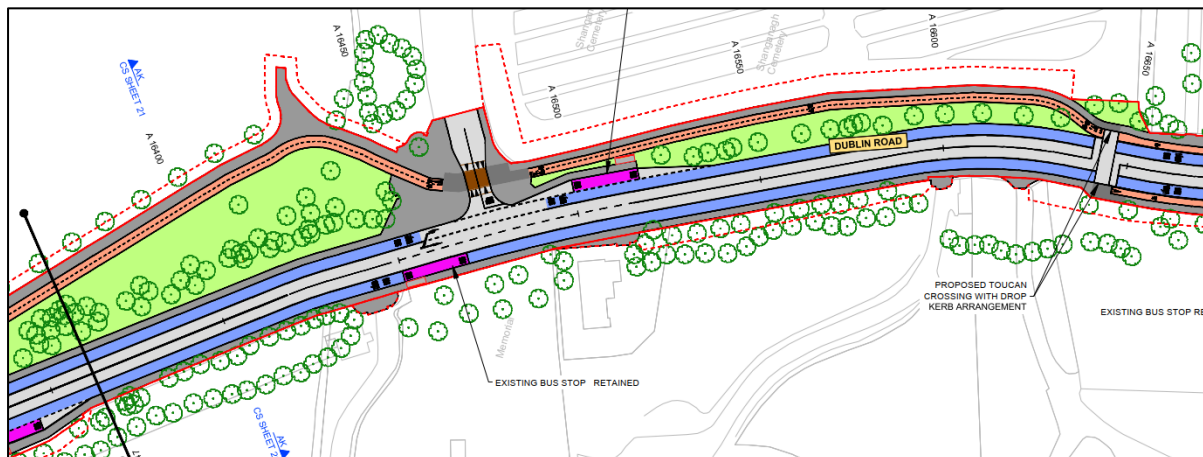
Extract from General Arrangement Drawing at Shanganagh Park/ Cemetery (Sheet 47)
